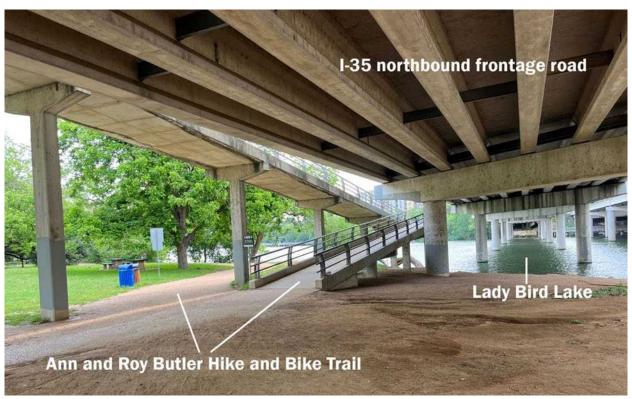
The Ann and Roy Butler Hike and Bike Trail crosses over Lady Bird Lake from this ramp located in Edward Rendon Park. The opposite end of this section of trail over the lake is seen in Photo 1 and Photo 8. This picture faces southeast.
